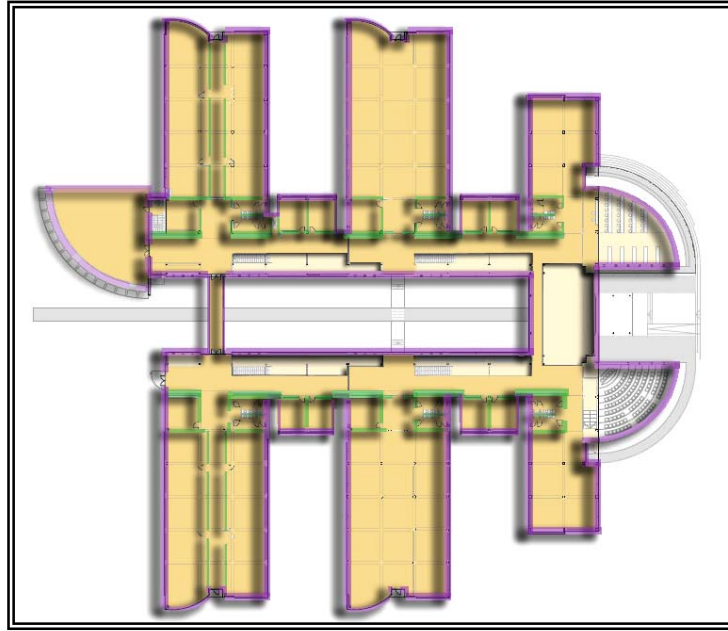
Adopted first floor plan of METU Twins. *Source:* METU Technopolis Coordination Office.
